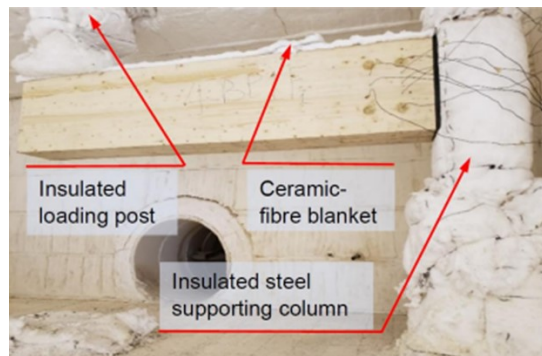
A test specimen installed inside the fire testing furnace at LUFTRL
